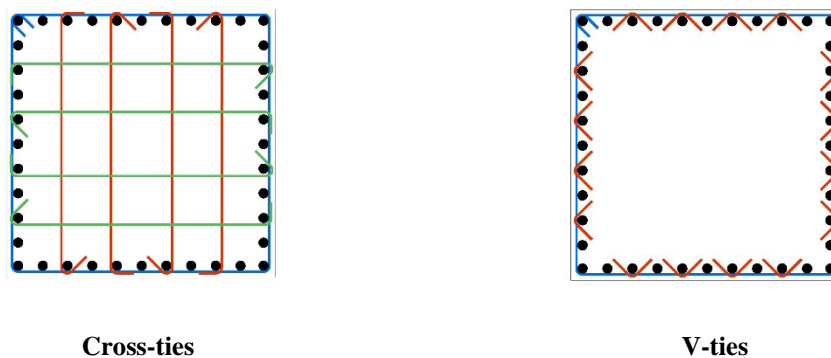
Details of transverse reinforcement for columns with cross-section (1000 *1000 mm).
